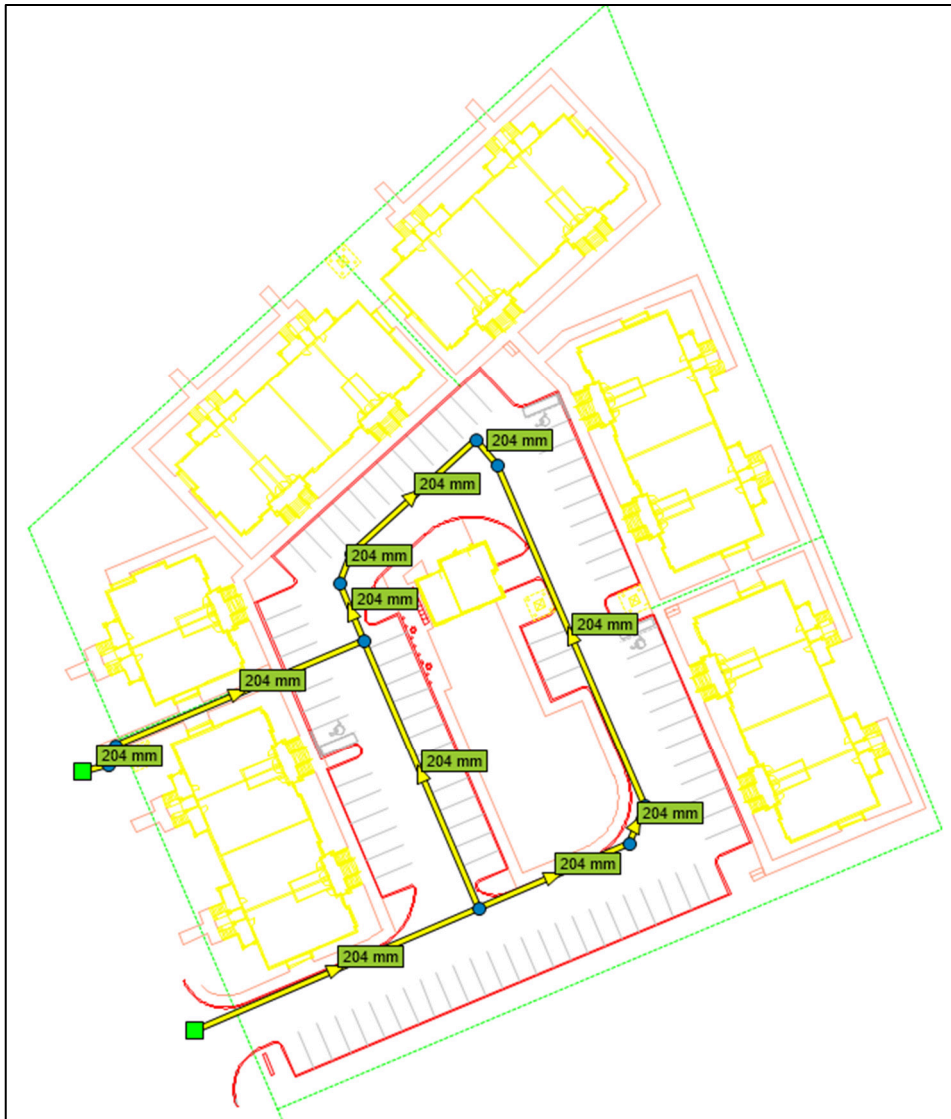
Proposed Watermain Layout and Pipe Diameters (mm)
